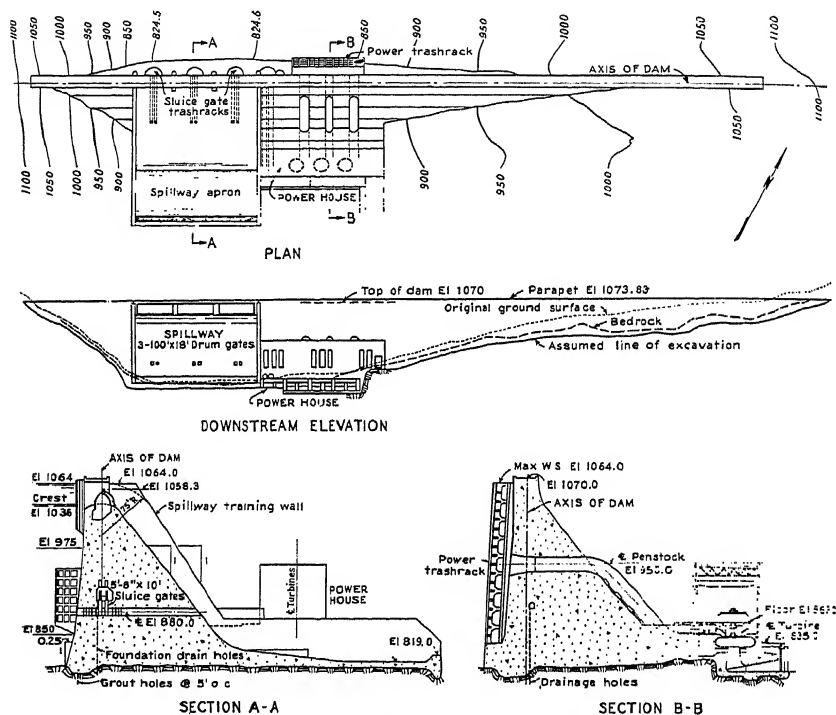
Preliminary design—Straight concrete gravity type dam.
